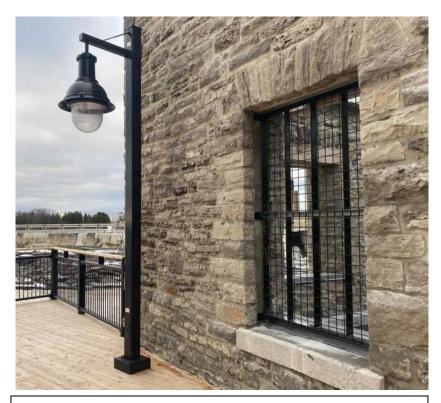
Black metal grilles installed at Chaudiere Falls Lookout, in Ottawa. Grilles were designed as guardrails to protect the public from a fall hazard. Spacing of metal bars mimic original window detailing.
